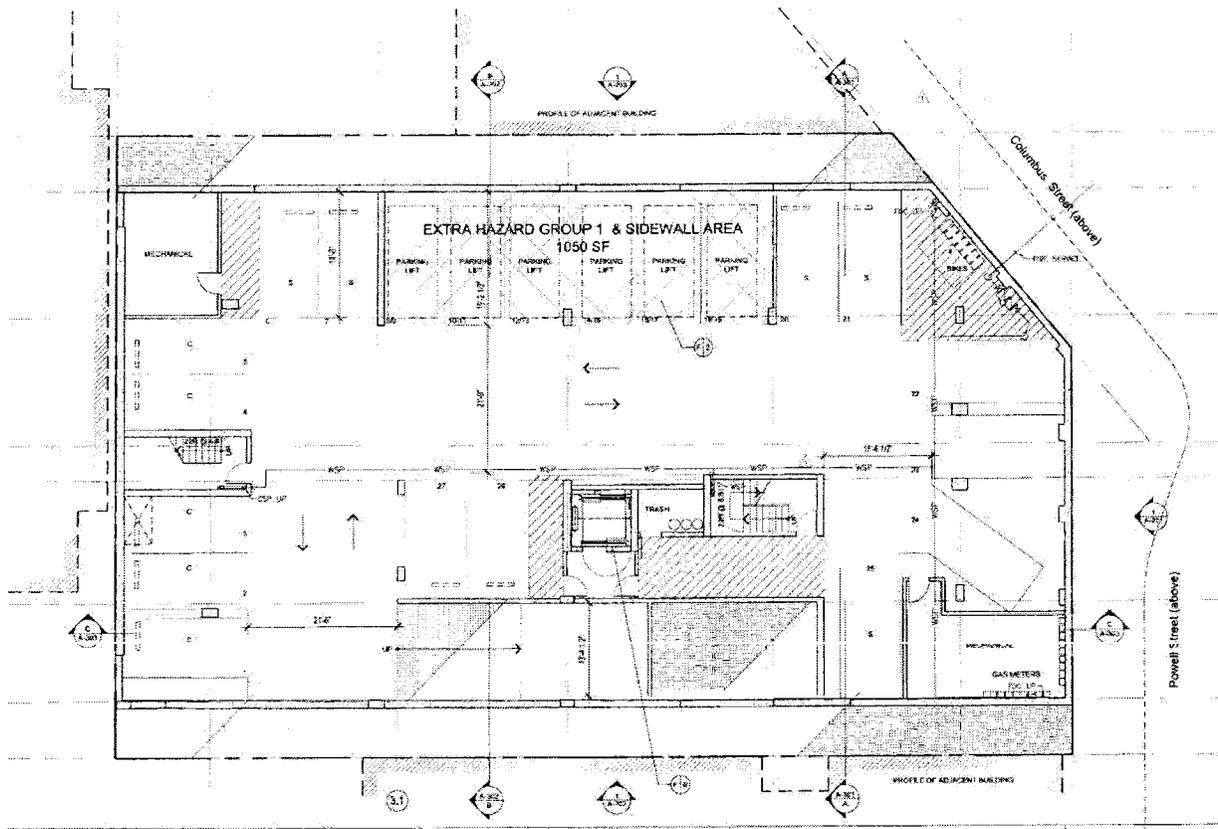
PROPOSED 1731 POWELL ST BASEMENT LEVEL PLAN
